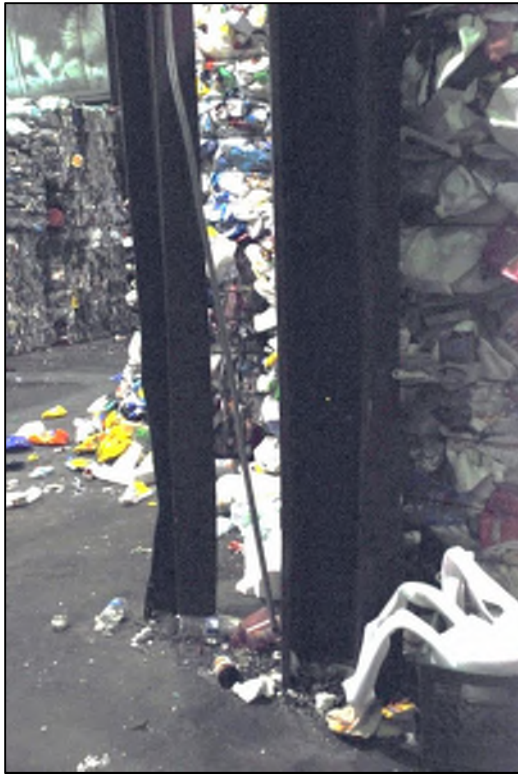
Damaged Structural Column Visibly Bowed At Juncture of Original Building and 1995 Addition
